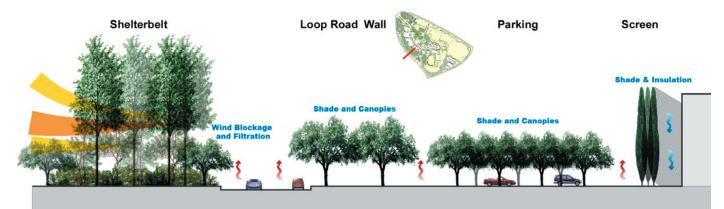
, (1) Shelterbelt, at least 25 meter wide with a variety of plants, (2) Canopy trees for Loop road and Parking and (3) Plant Screen to maximize shades on south west building facades.
